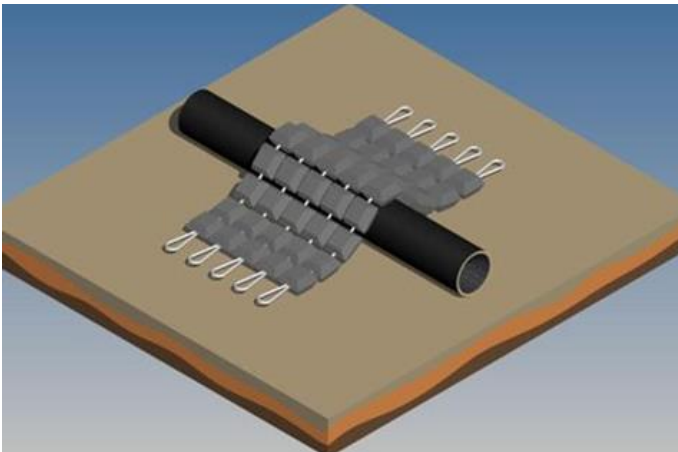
Concrete mattress for span rectification or pipeline protection or stabilisation
